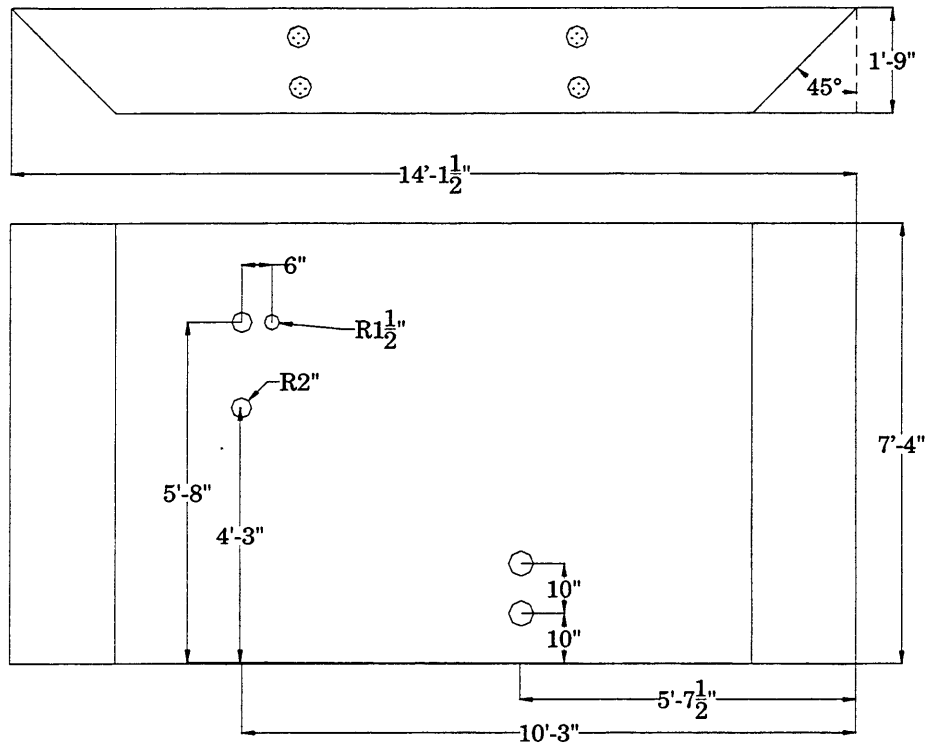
Block SO-3 will be used to shield the ceiling.
